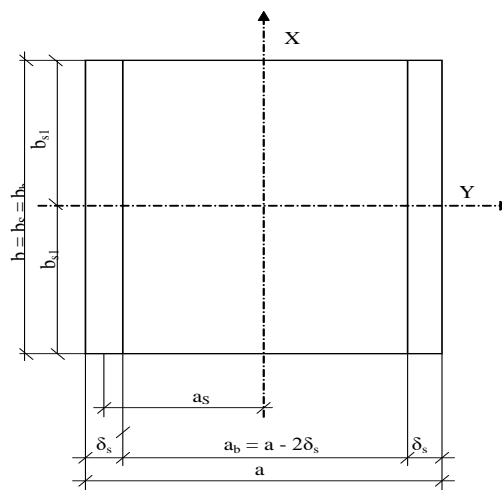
Cross section of a steel concrete element with sheet reinforcement in the calculation for a steel-cut cross-section
